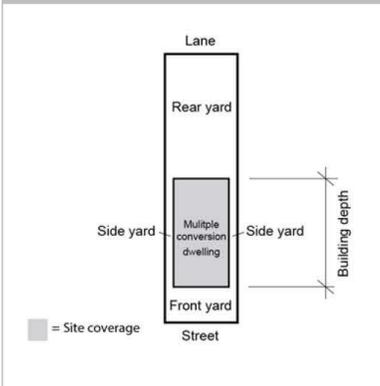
(b) Multiple conversion dwelling building placement
